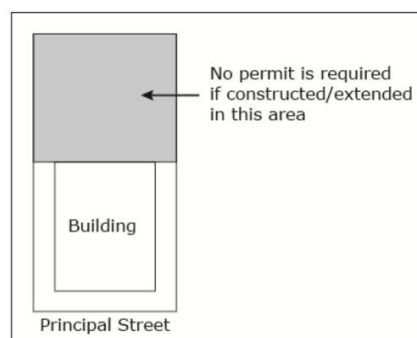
Construction/extension of a pergola/verandah to a contributory or not contributory property (not located on a corner site); and a deck to all properties.
